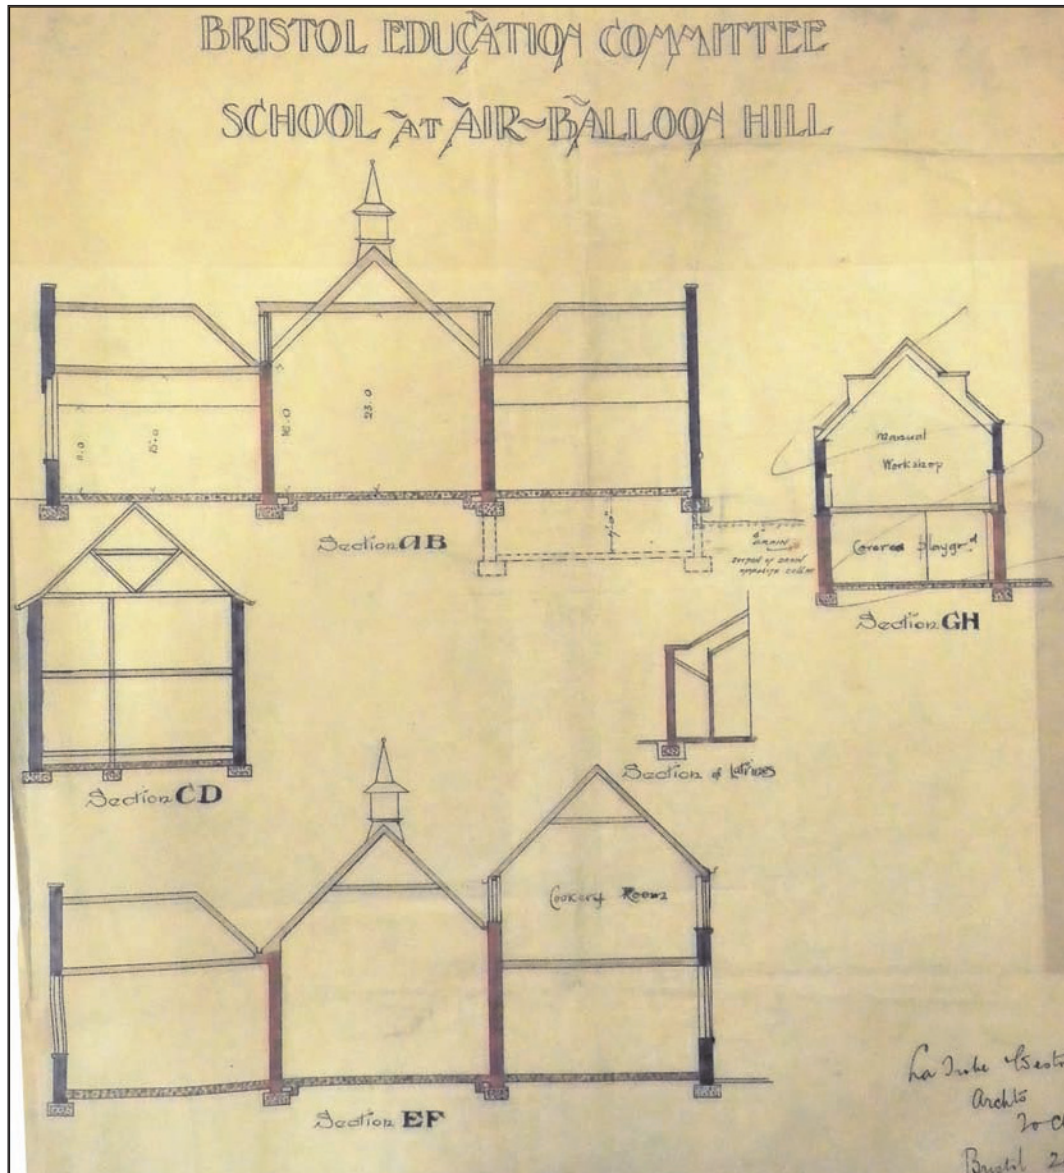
Architects' drawings dated 1903 showing sections and footings of caretaker's house, manual workshop & boys' latrine block
